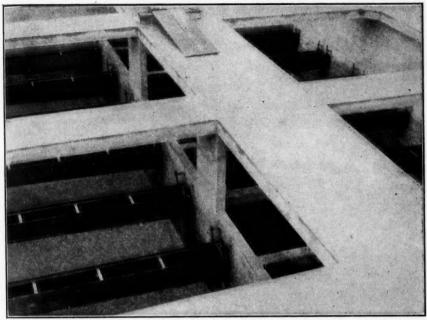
View of Wash-Water Gutters in Sacramento Filtration Plant, Adjustable in Elevation by Means of Hanger Bolts at Each End.
